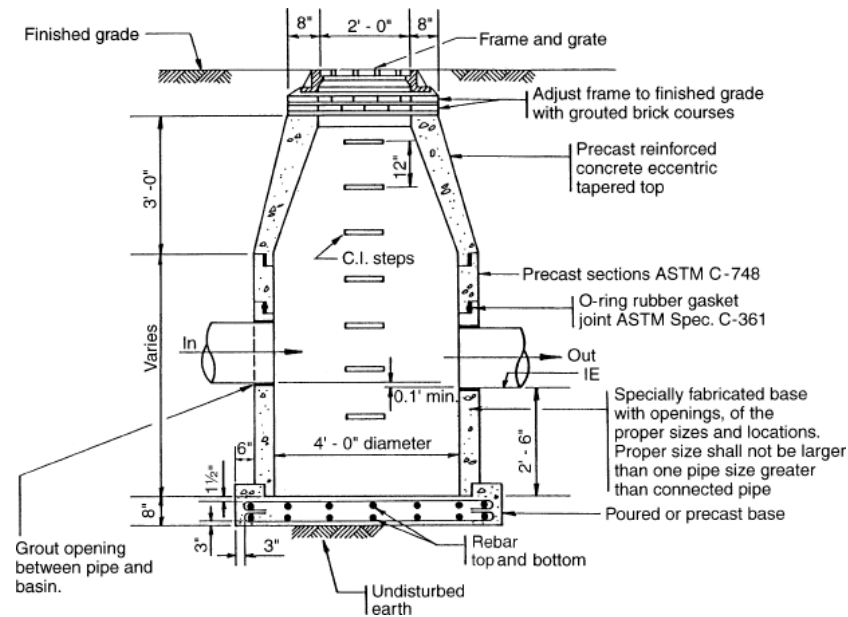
Stormwater sump detail (Frankel, 2012)
